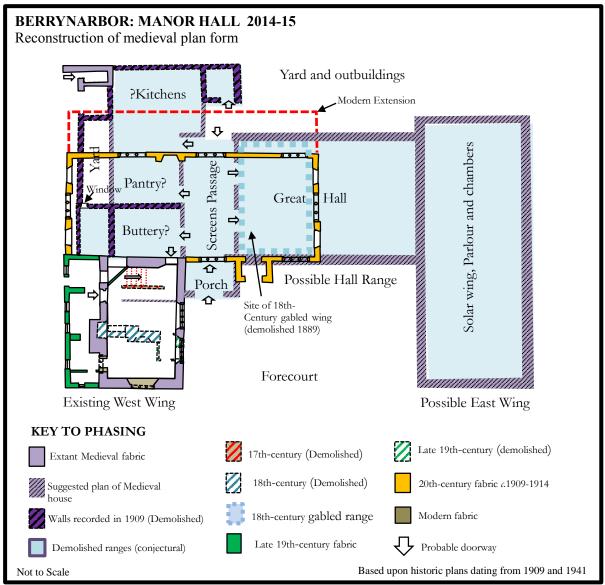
Suggested reconstruction of the layout of the medieval house, based upon historic plans and maps of the buildings and upon Gentry houses of similar date and status.
